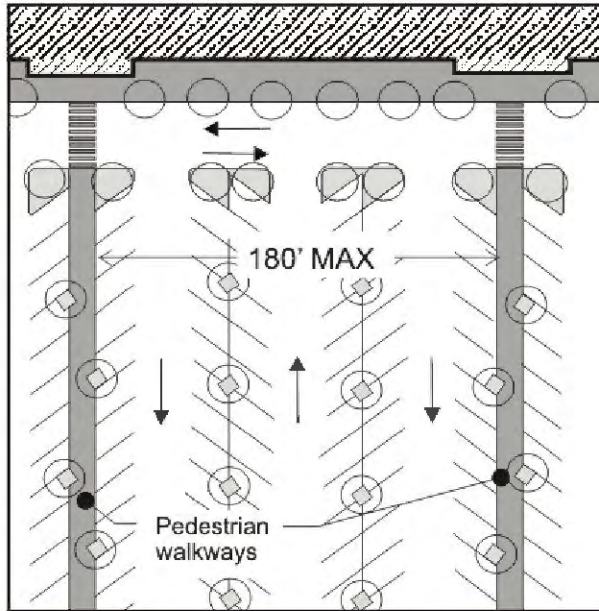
D.1.2-2. Sample parking area pathway configuration.
